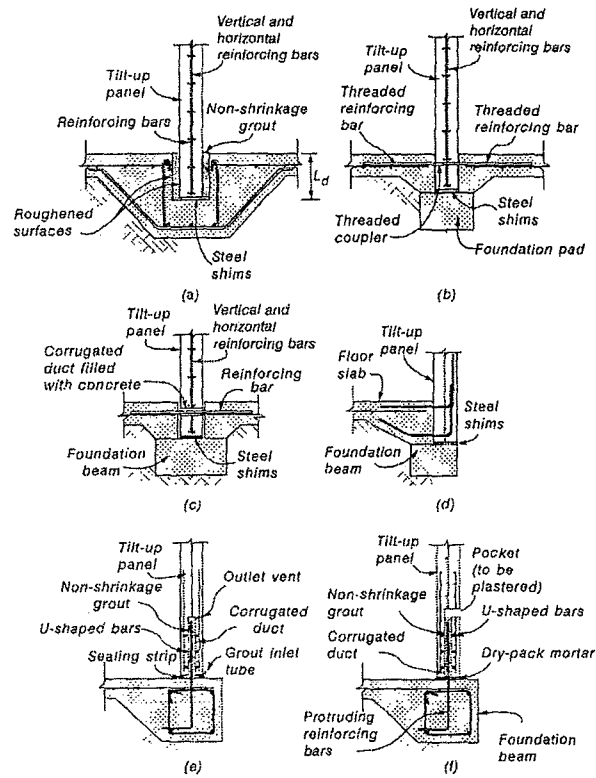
Wall-foundation connection designed as cantilever wall [C1]
